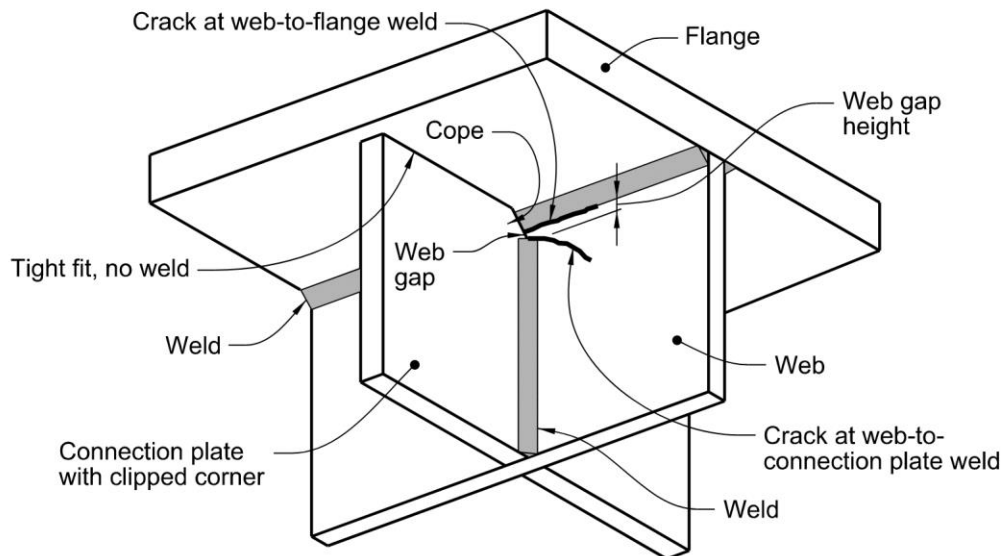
Intersection of a bearing stiffener also functioning as a transverse connection plate with a girder web and a girder flange (welded to the compression flange only).
